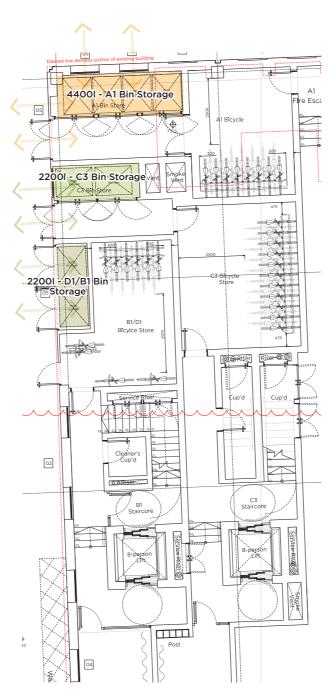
Waste storage on ground floor for A1, B1/D1 & C3 use
